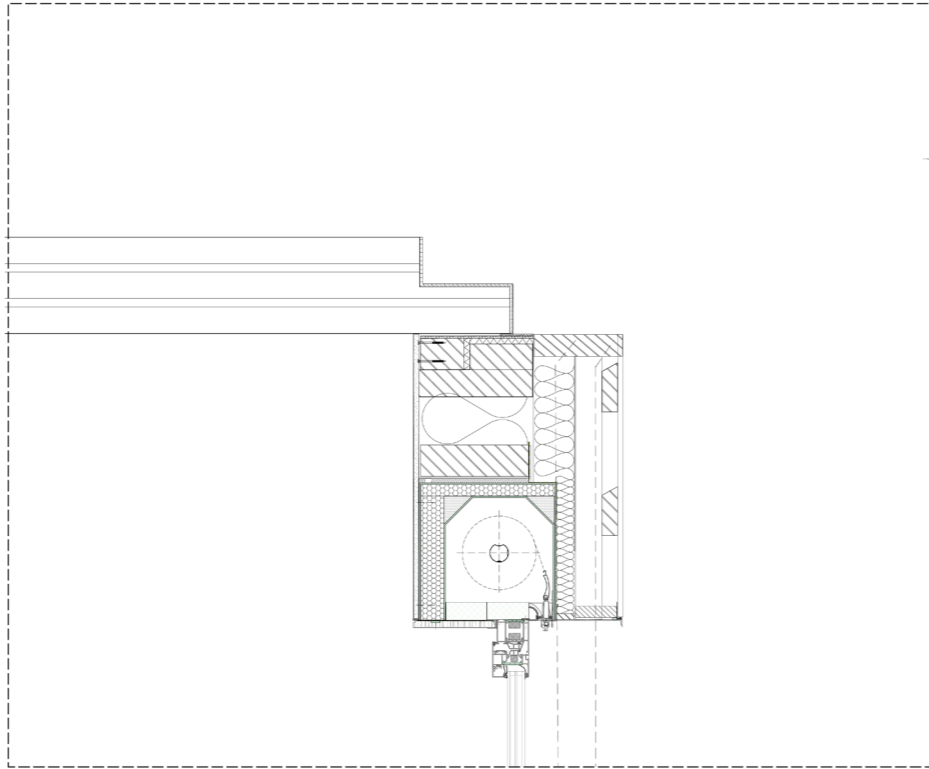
FACADE TO FLOOR (CONCRETE)
